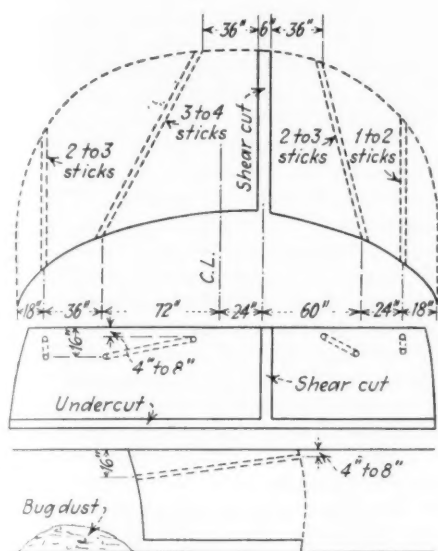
Standard Plan of Drilling and Shooting in 21-Ft. Rooms. Not Over Ten Sticks (3.47 Lb.) Per Room, Giving 34 Tons of Coal.
